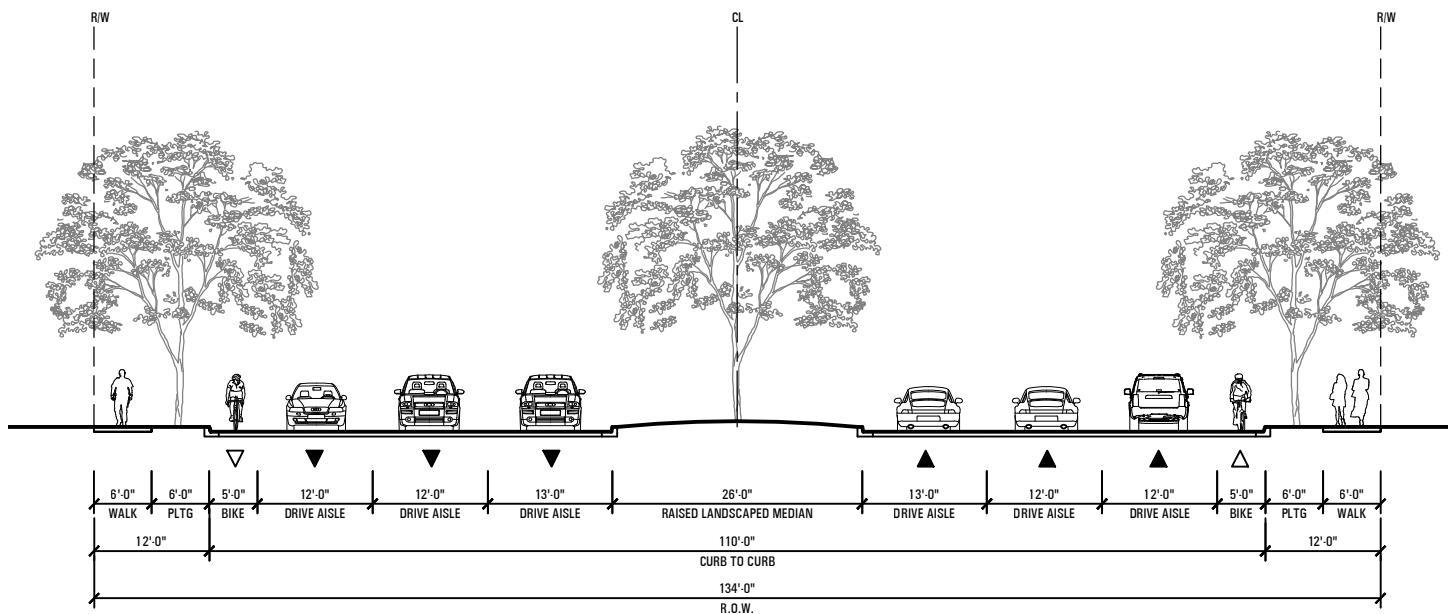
Duncan Canyon Road Section (East of Lytle Creek Road)
